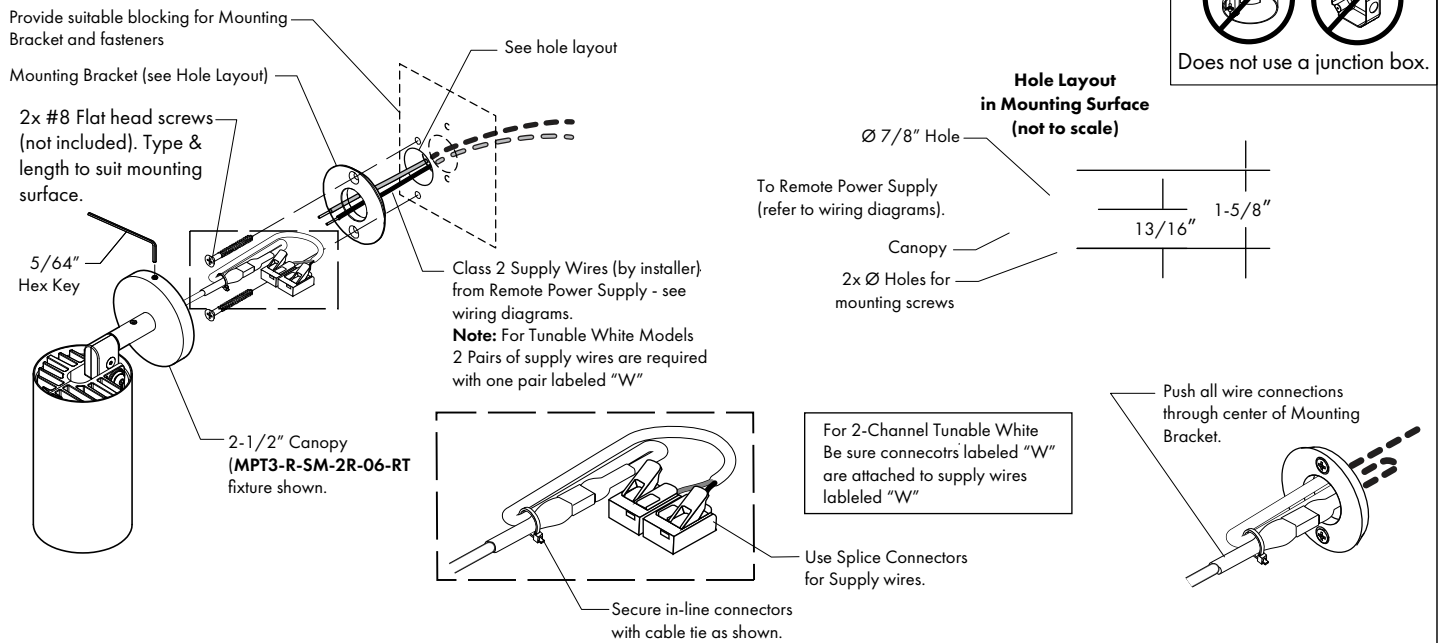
MPT3-S/R-SM-2R/S-RT Wire & Install Fixture
